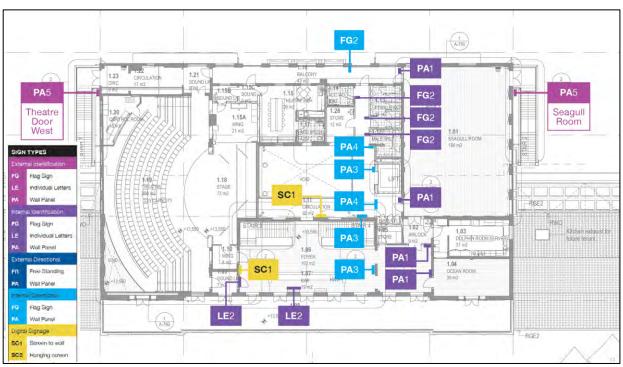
Extract of first floor level plan demonstrating location of proposed signage discussed in detail below.
